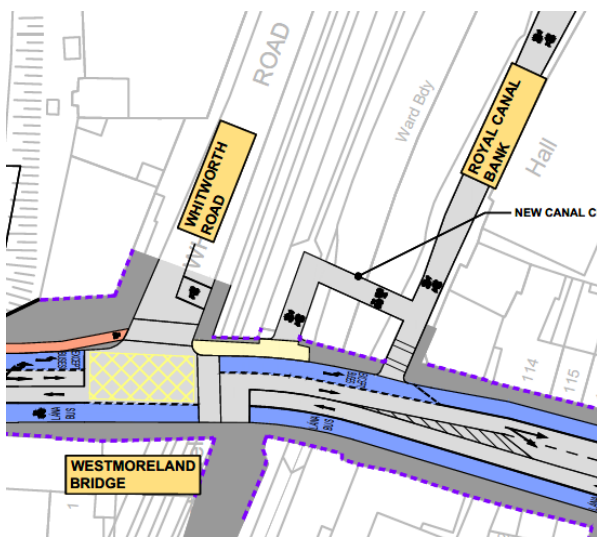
EPR arrangement over Cross Guns Bridge Option A
